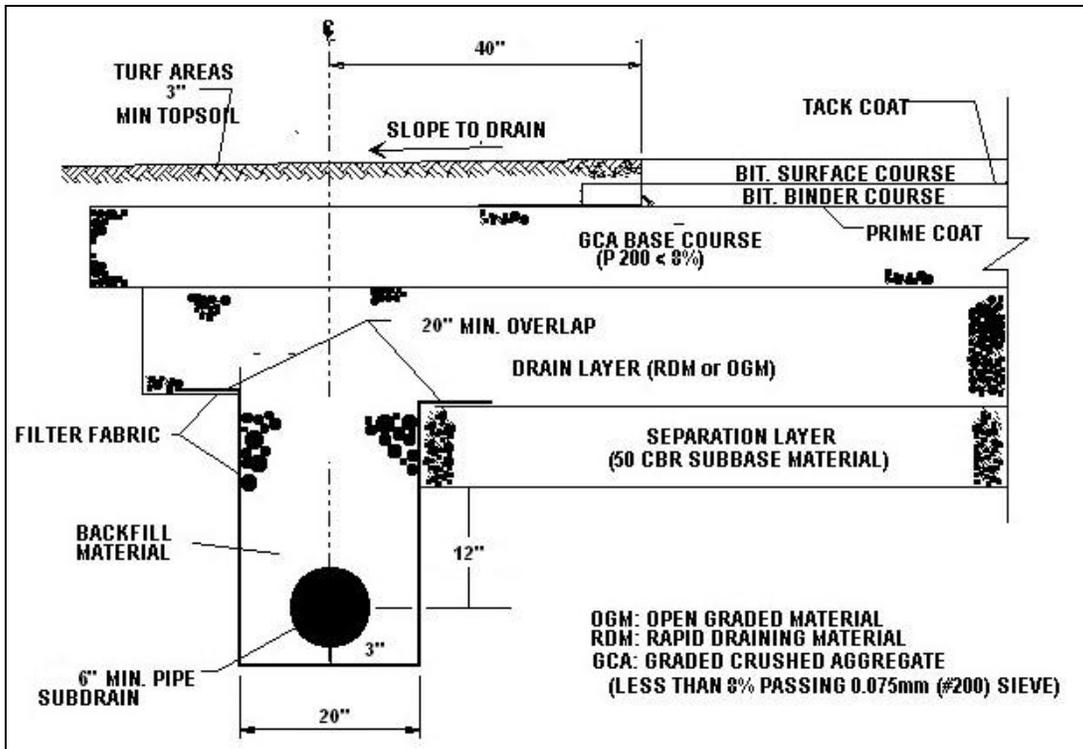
Typical Edge Subdrain Detail for Flexible Pavements
